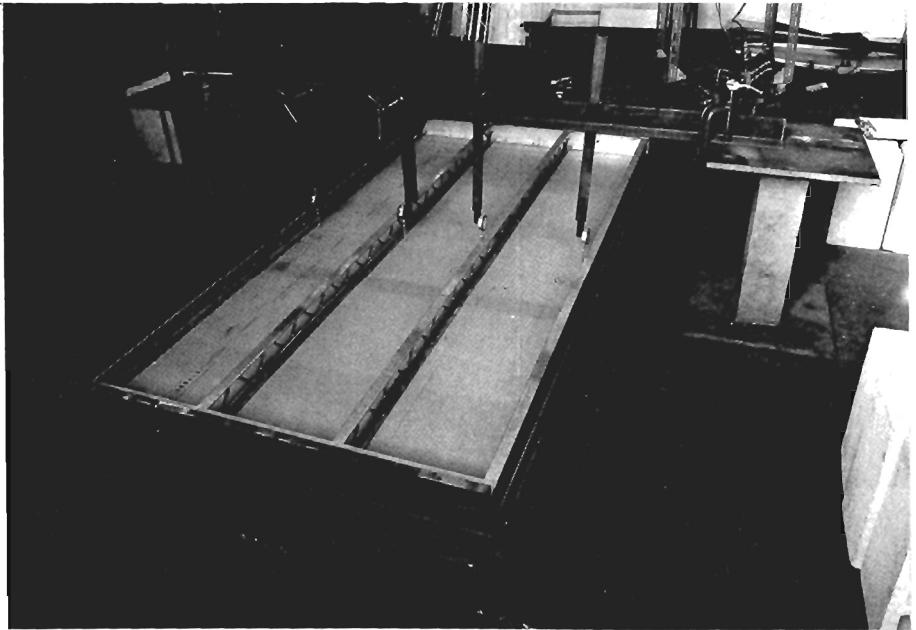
PHOTOGRAPH SHOWING TYPICAL FULL SCALE WALL STUD PANEL TEST SET-UP
